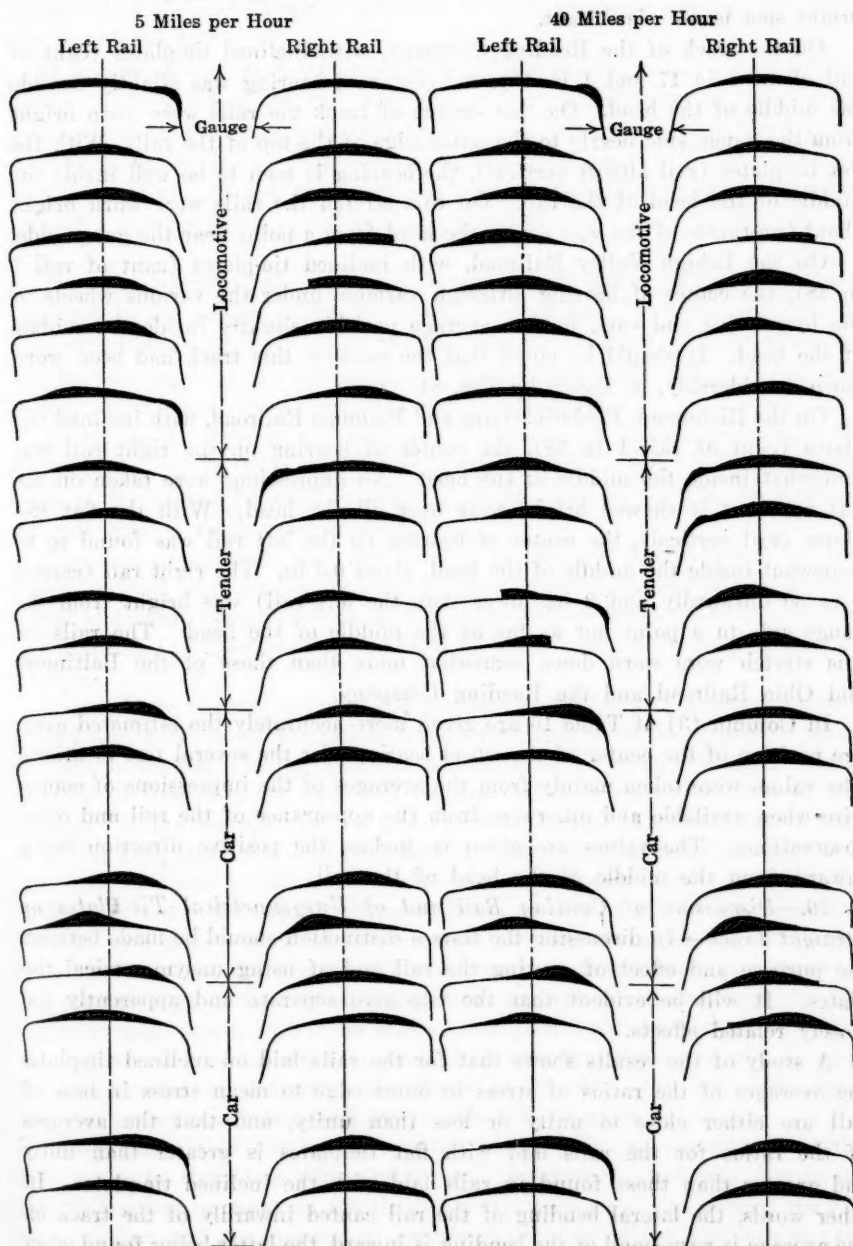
BEARING OF WHEEL ON RAIL, STRAIGHT TRACK. INCLINED TIE-PLATES. SANTA FE TYPE LOCOMOTIVE AND CARS. LEHIGH VALLEY RAILROAD.
